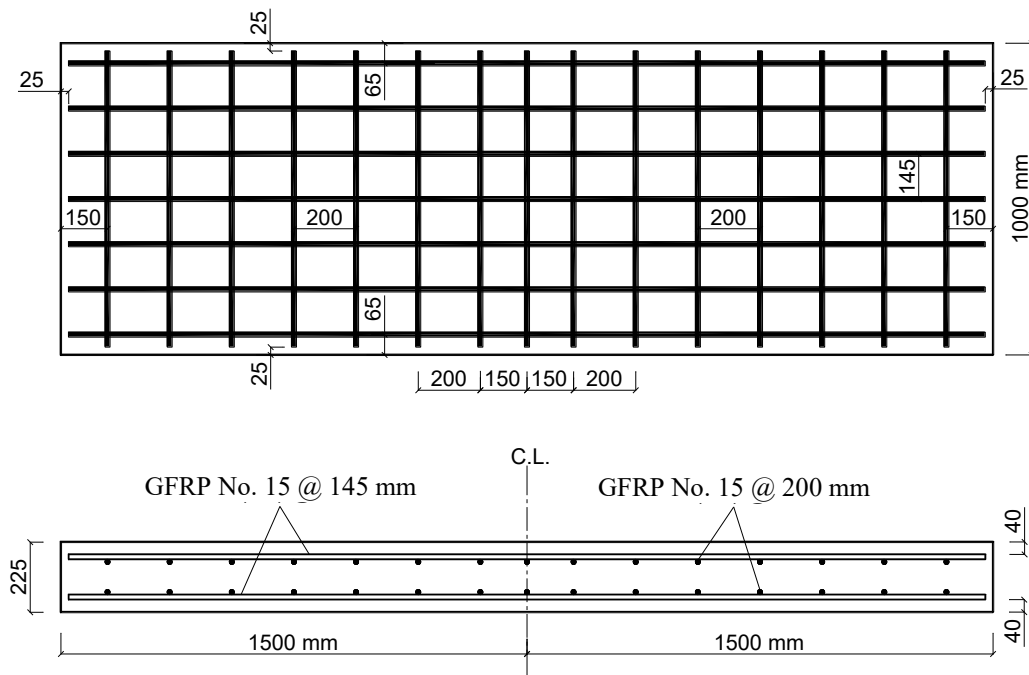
7 – Concrete dimensions and reinforcement details of reference specimen (G-R-15-B)
